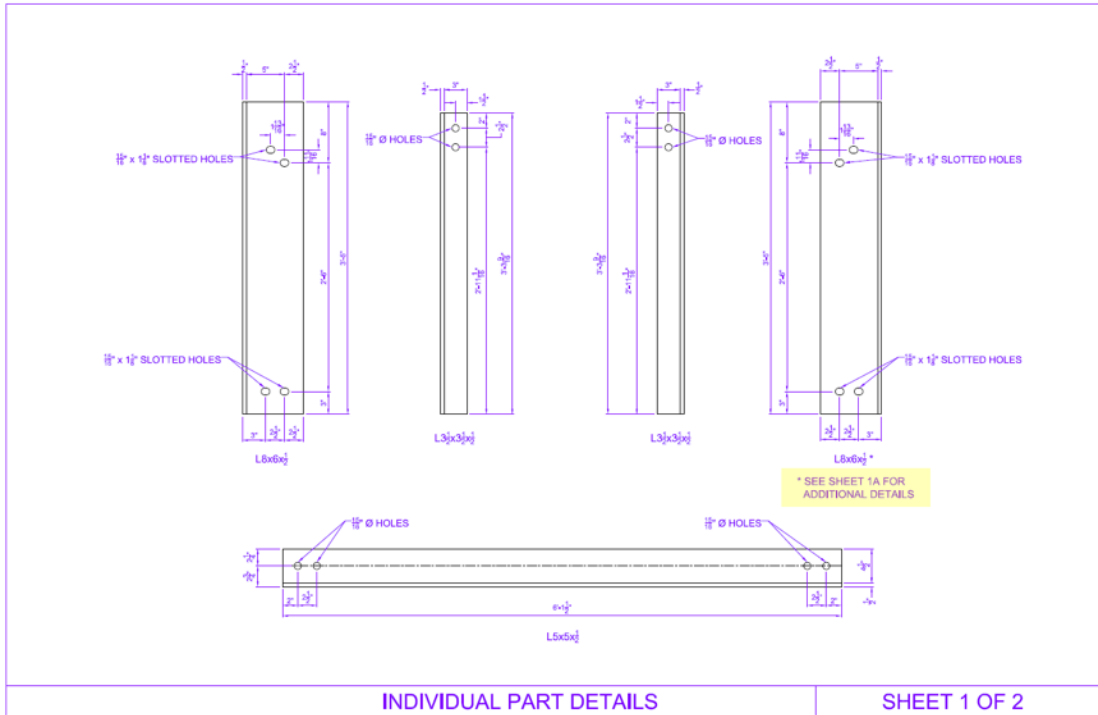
Engineering Drawing. Fabricated k-frame replica (1 of 3)
